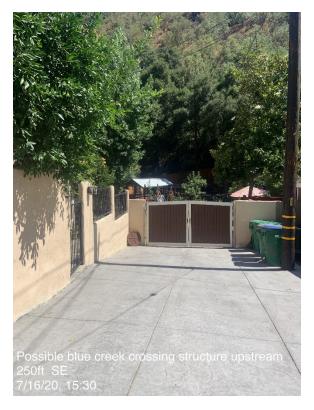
There is possibly a blue creek crossing structure location southeast of the Bridge.
